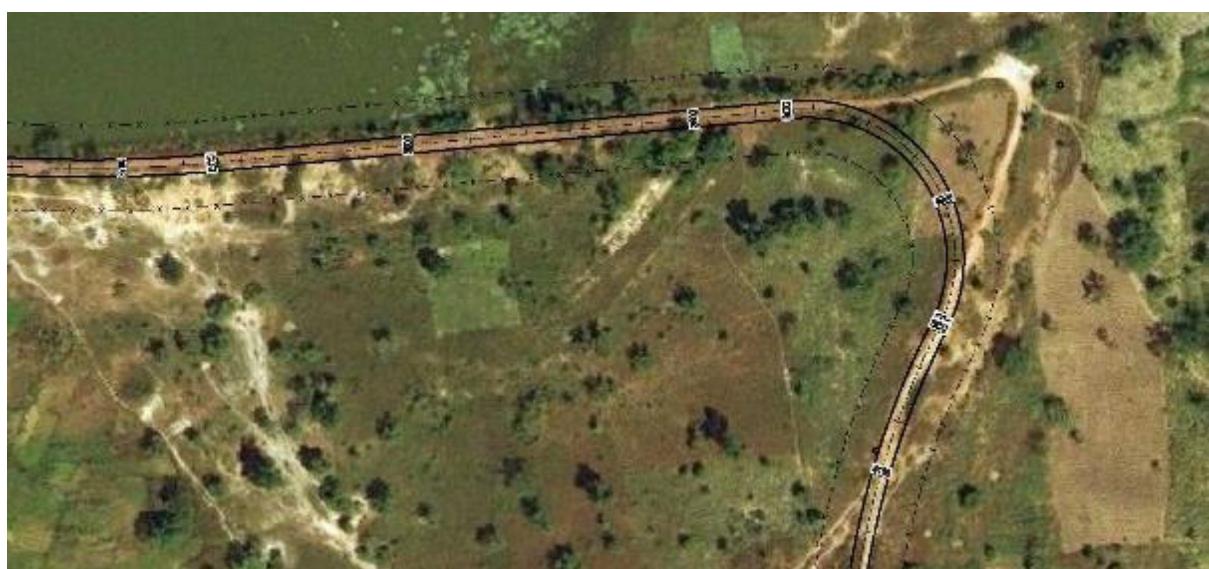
Proposed Re-alignment of Road P1_28 at Dam
